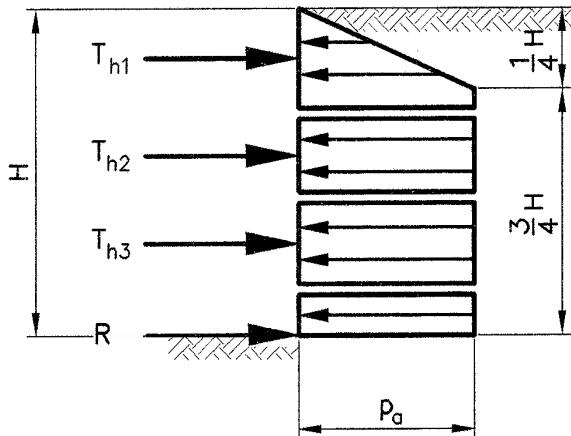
1—Apparent Earth Pressure Distribution for Anchored Walls Constructed from the Top Down in Soft to Medium Stiff Cohesive Soils
